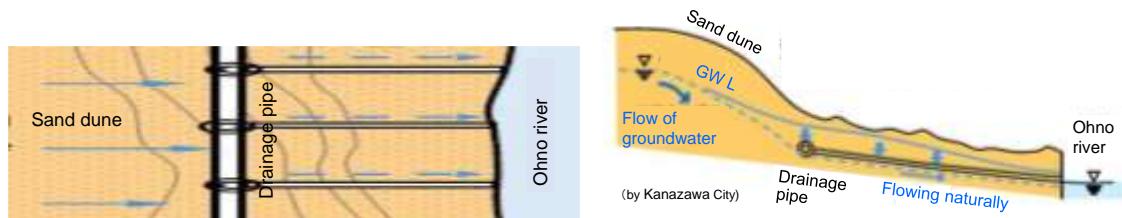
Idea for the layout of an effective network of underground drainage pipes [KCDATRC, 2024]
